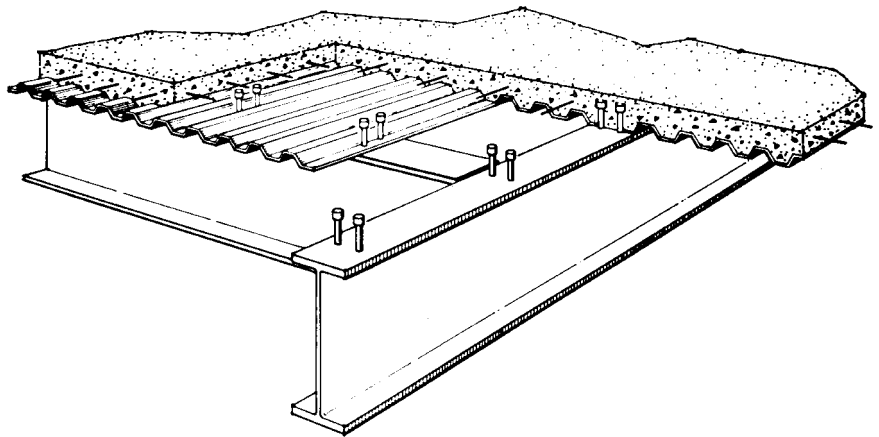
Composite beam using steel-deck-reinforced concrete slab.^{1.96}
